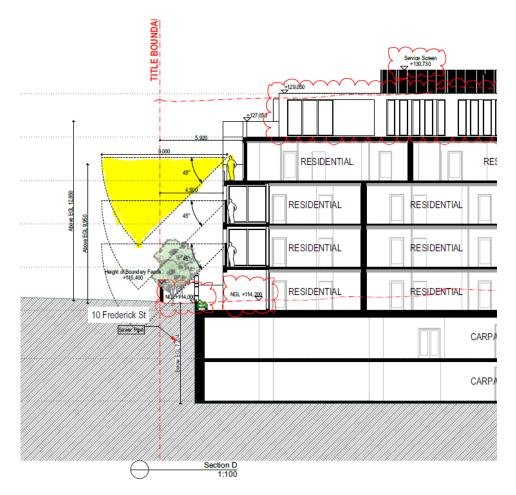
Downward views to the west from the balcony at third floor level do not have direct views to secluded private open space (note ground, first and second floor levels have been screened on the western elevation).
